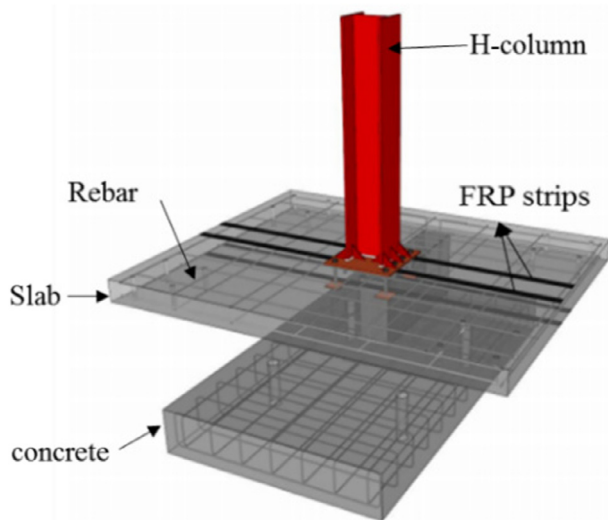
Concrete slab reinforced by FRP plates (half straight wall, penetrating headed bolts) [9,10].
